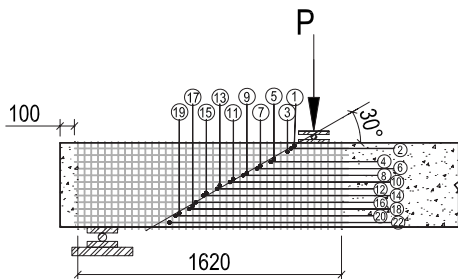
SG setup for beam specimen C40s0-M2-G2a
